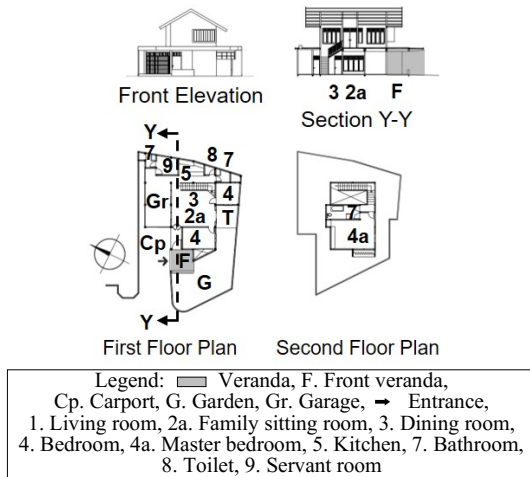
Small house of Abdullah Albawahab (1968)⁴⁾
